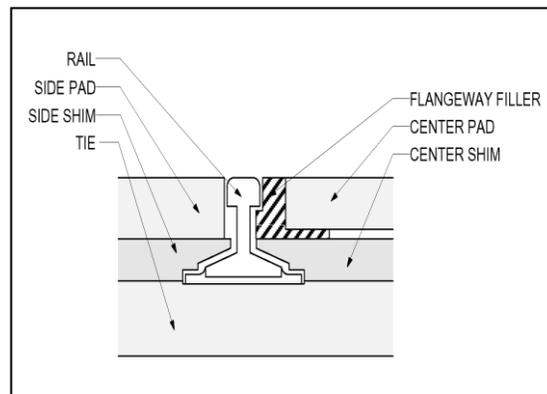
Flangeway fillers can improve a rough railroad crossing surface by minimizing the gap between the rail and the pavement.
